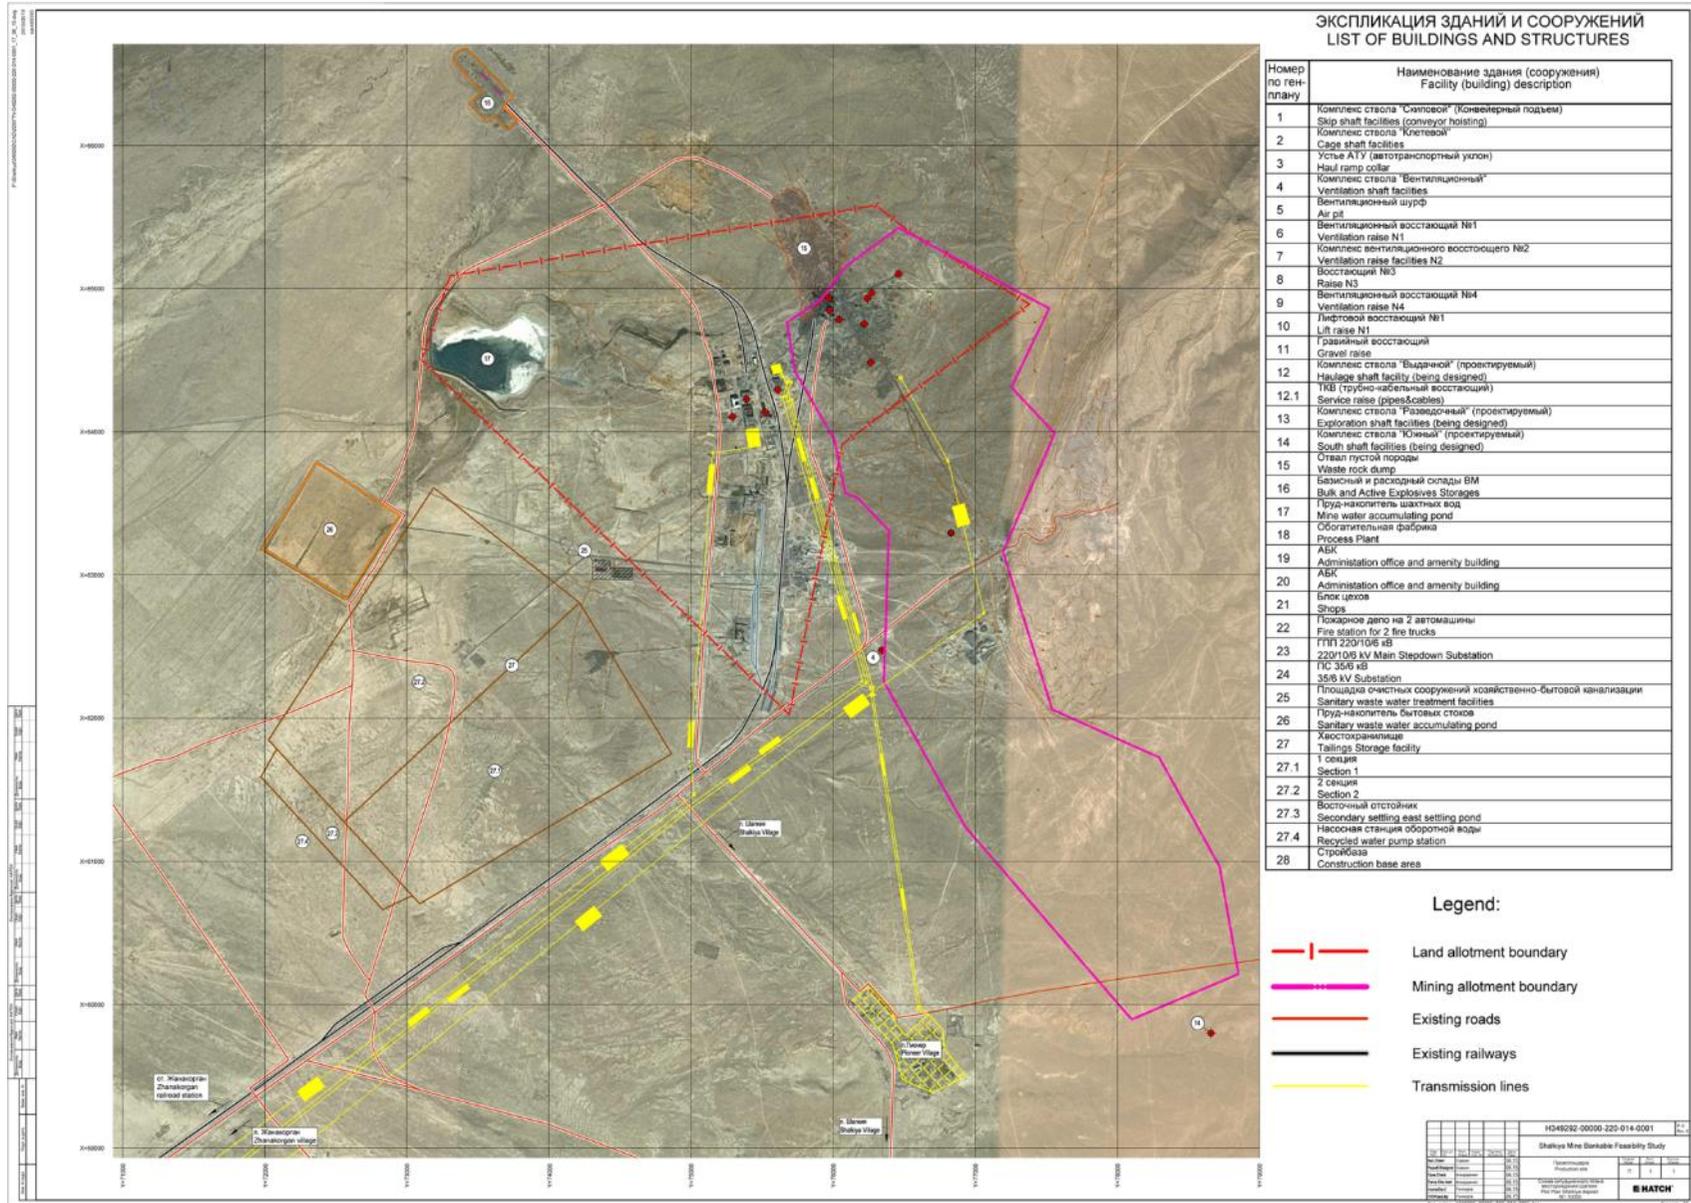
Location of the ore body, the current mine infrastructure, proposed Tailing Storage Facility (TSF) location and the waste rock stockpiles
